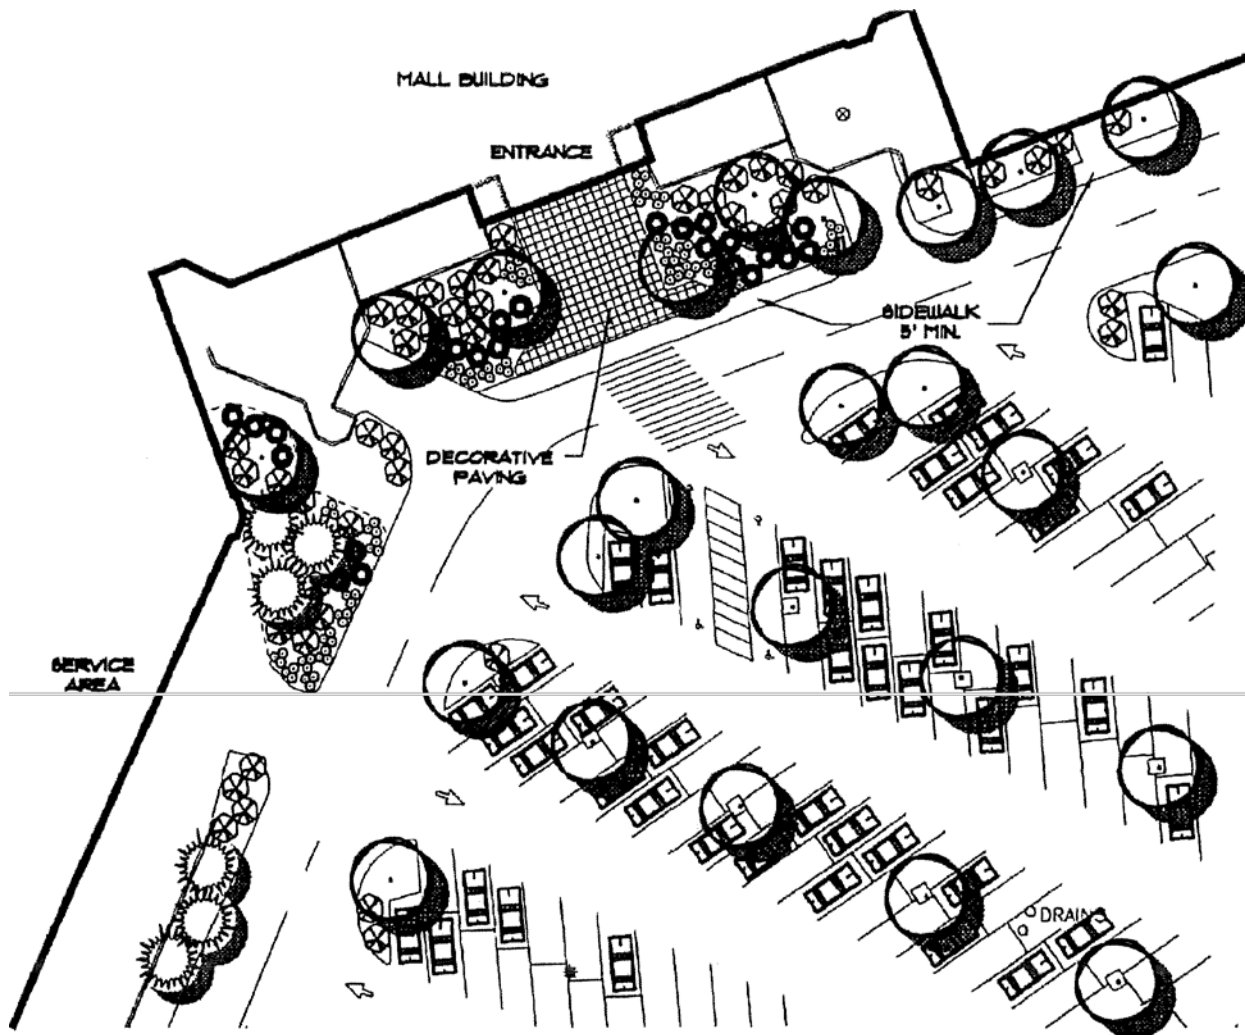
A TYPICAL FOCAL MALL BUILDING ENTRY LANDSCAPE TREATMENT
